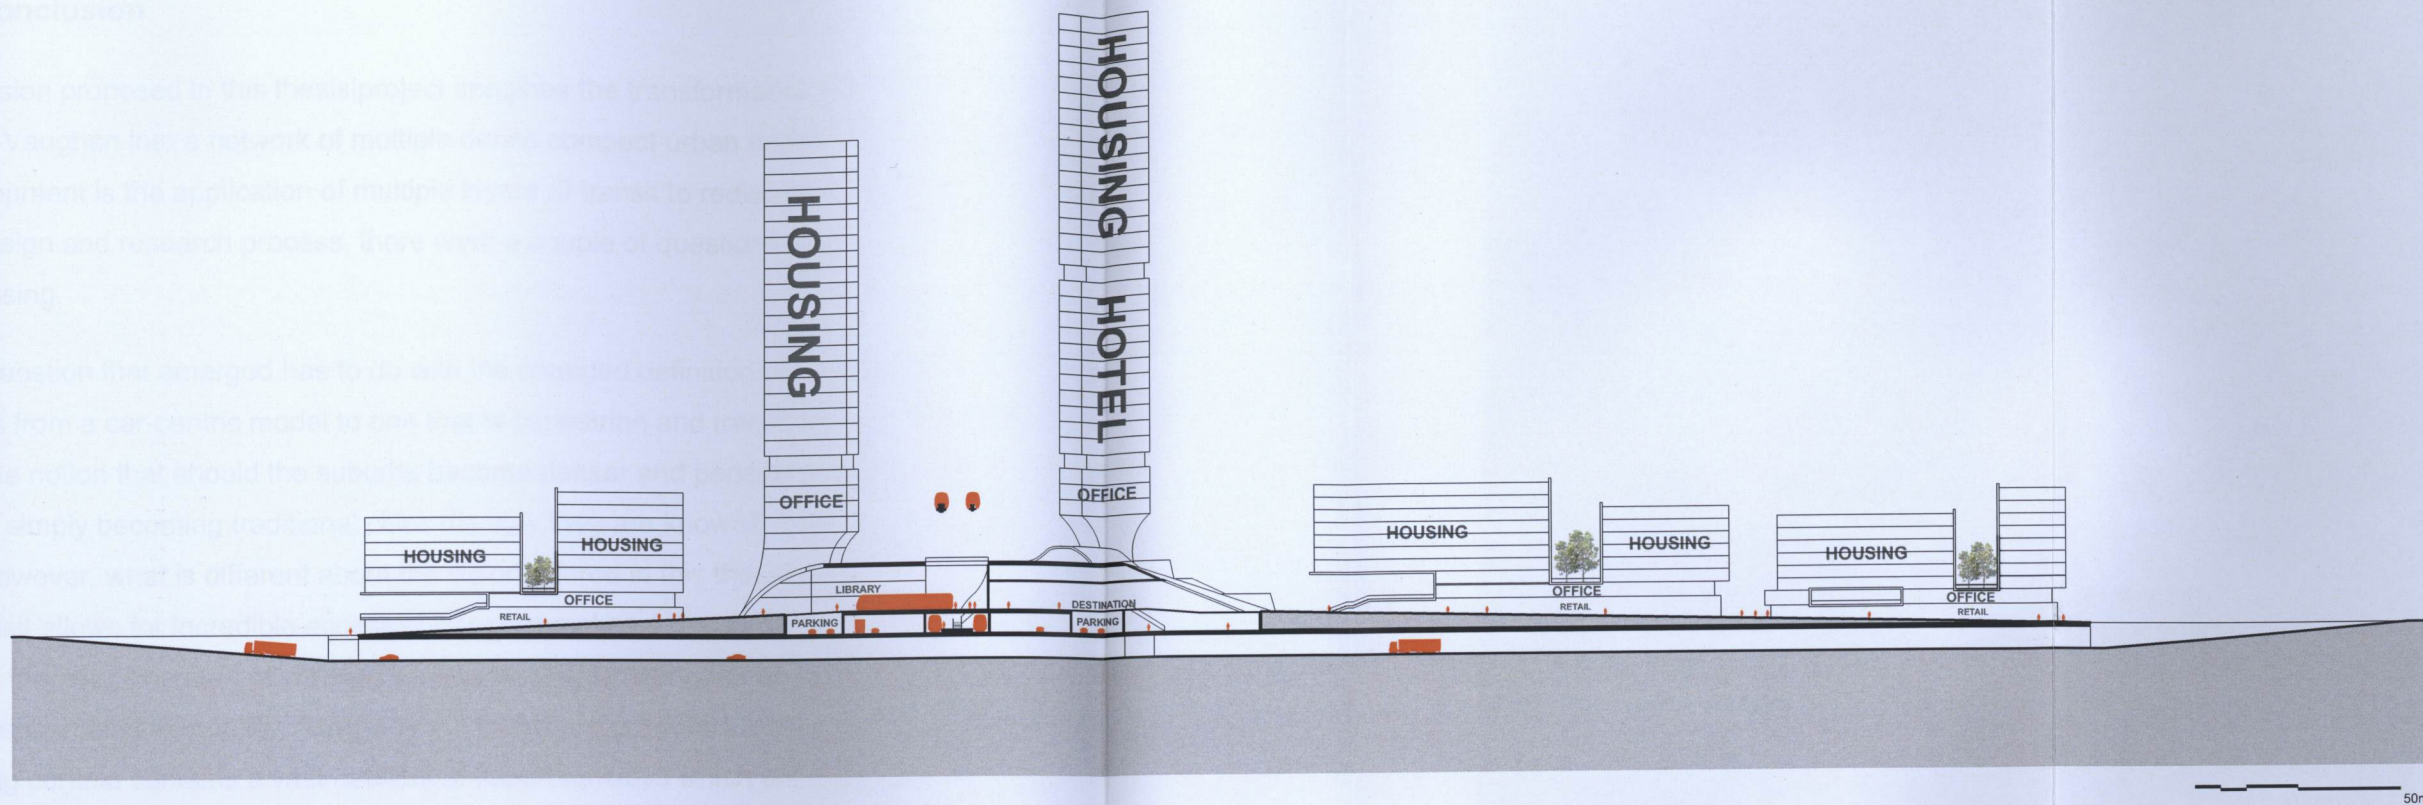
Section C (fig. 6-25) cut through the boulevard looking north
